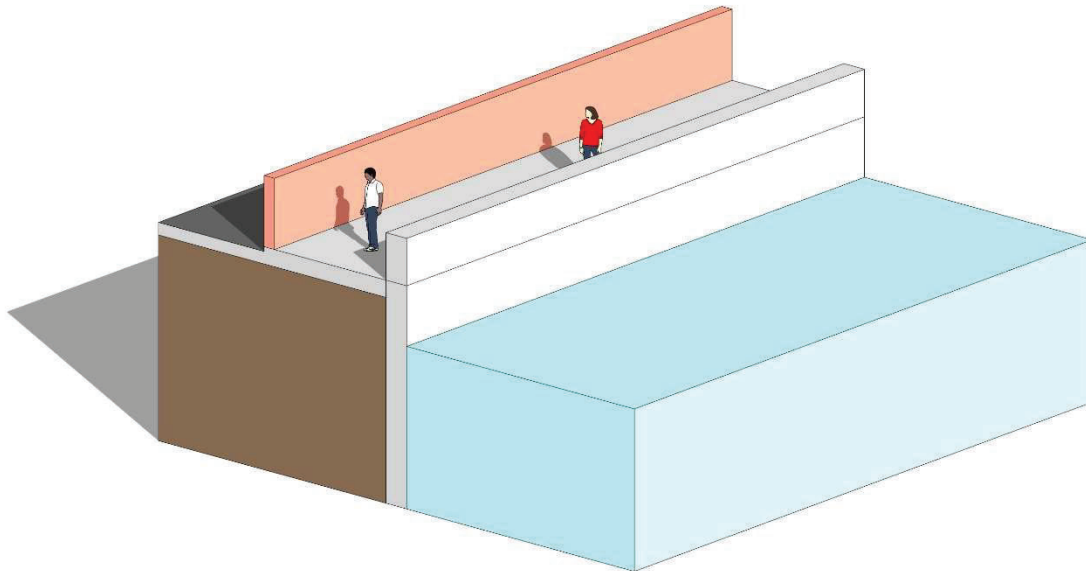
Barrier Behind Existing Defence Solution Sketch
